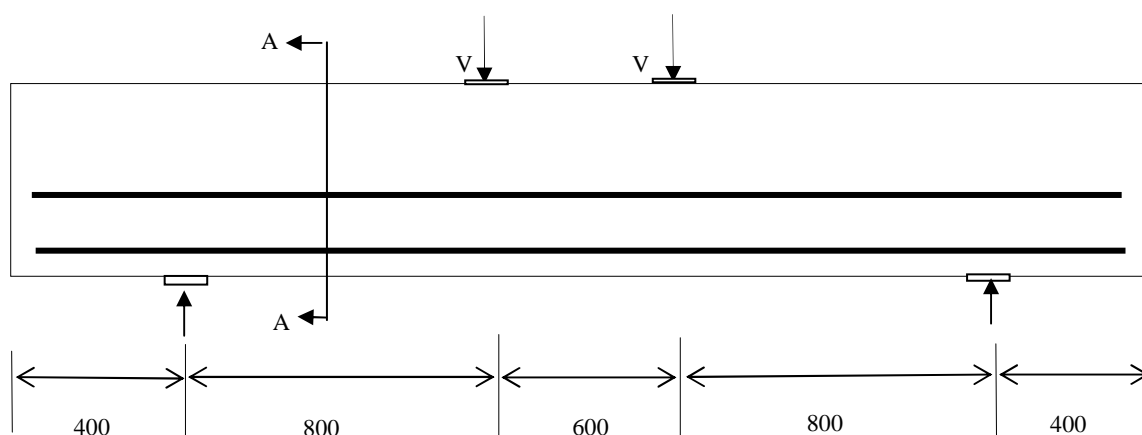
Hejazi's test arrangement for four beams of normal strength with different sizes of web steel. Geometry and reinforcement, excluding stirrups, is the same as Figure 3.1
